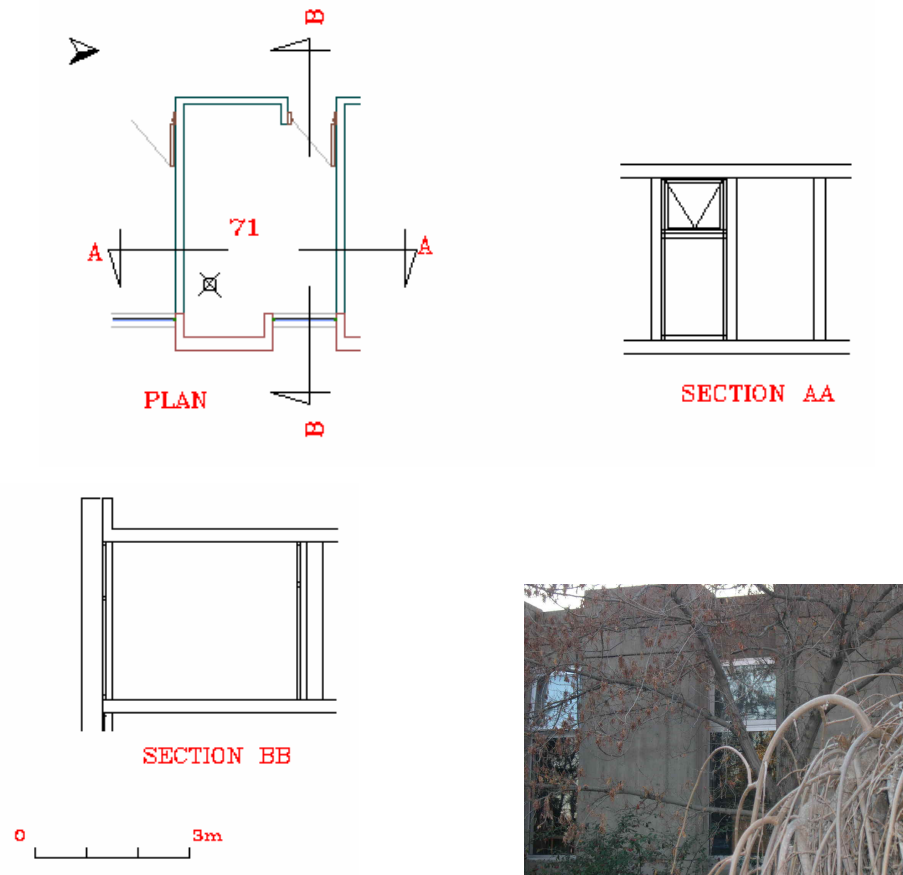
Floor plan, section AA, section BB and exterior view of Room 71.
